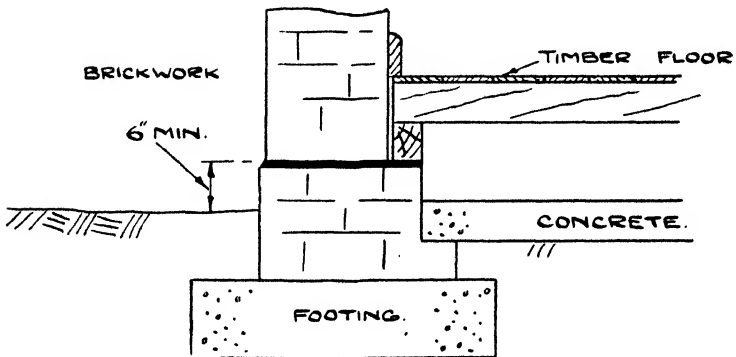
CONSTRUCTION OF ASPHALTE D.P.C. TO A TIMBER FLOOR FOR A SOLID WALL
